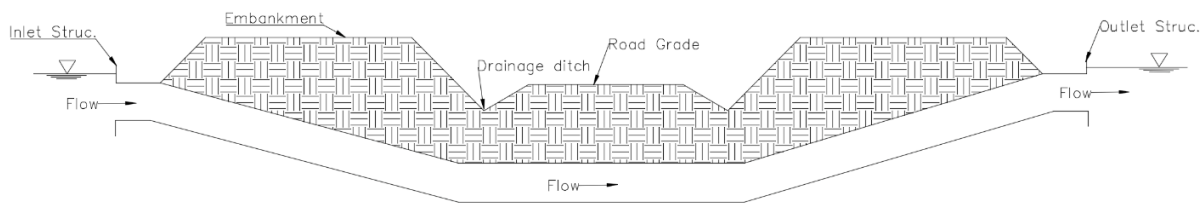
Typical siphon profile (Adapted from UDT 2004).
